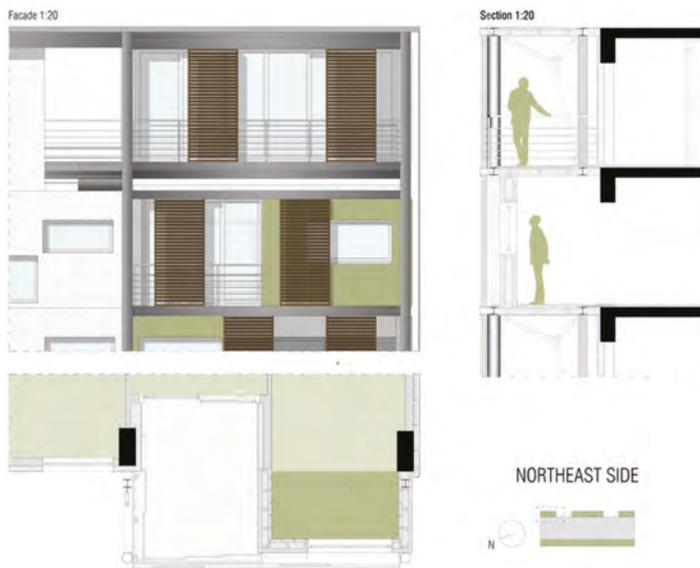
Façade, plan and detailed section of a typical application of the GET system on the Peristeri building.
